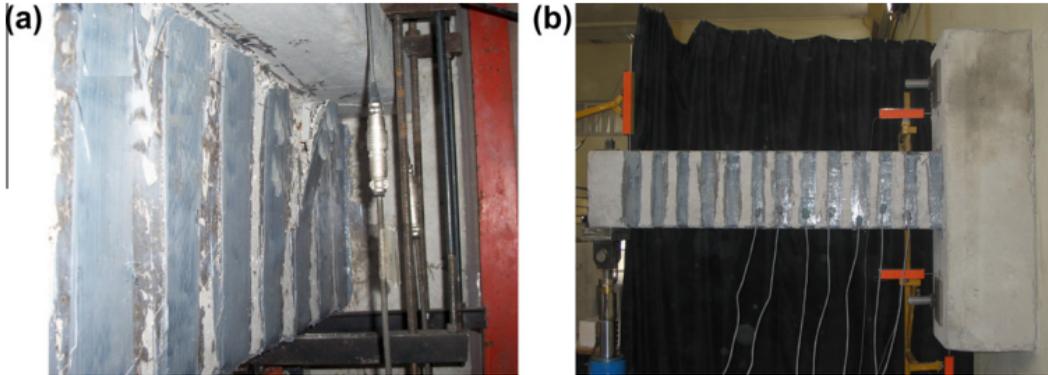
Failure mode of RC beams bonded with FRP, a) T-section, b) Rectangular-section [72].
